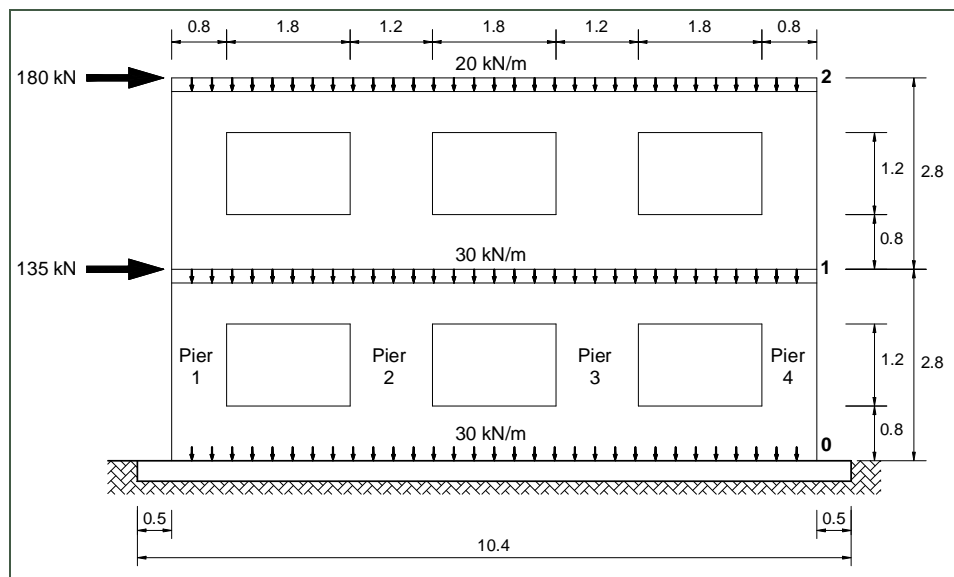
Limited Ductile 2-Storey Masonry Wall with Openings.
